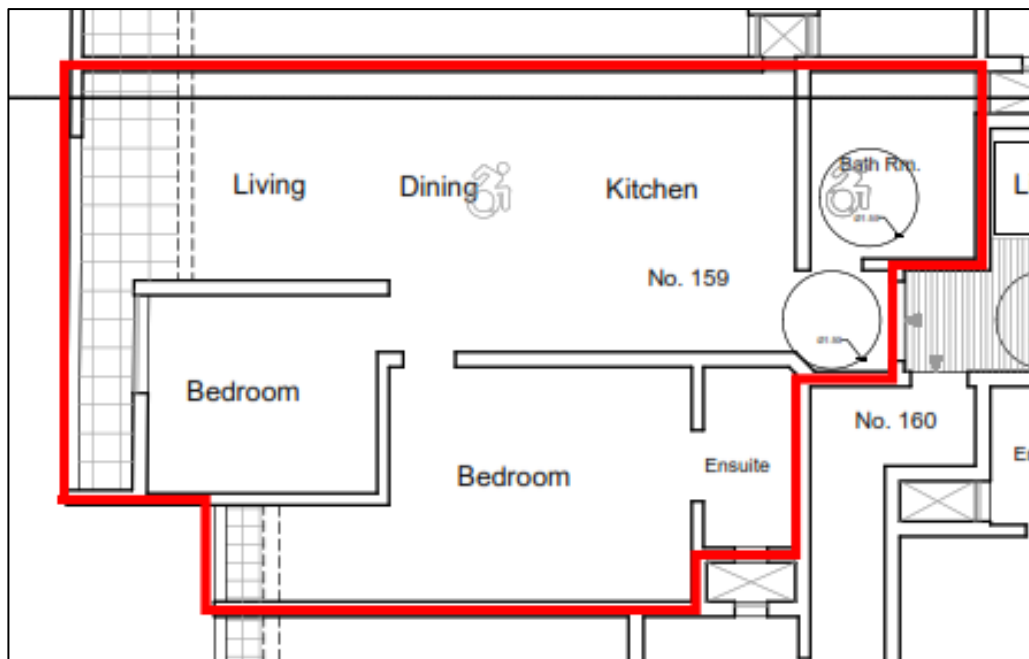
G - LATEST APPROVED PLAN (NOT TO SCALE) DOC 448G - PA/1424/17
